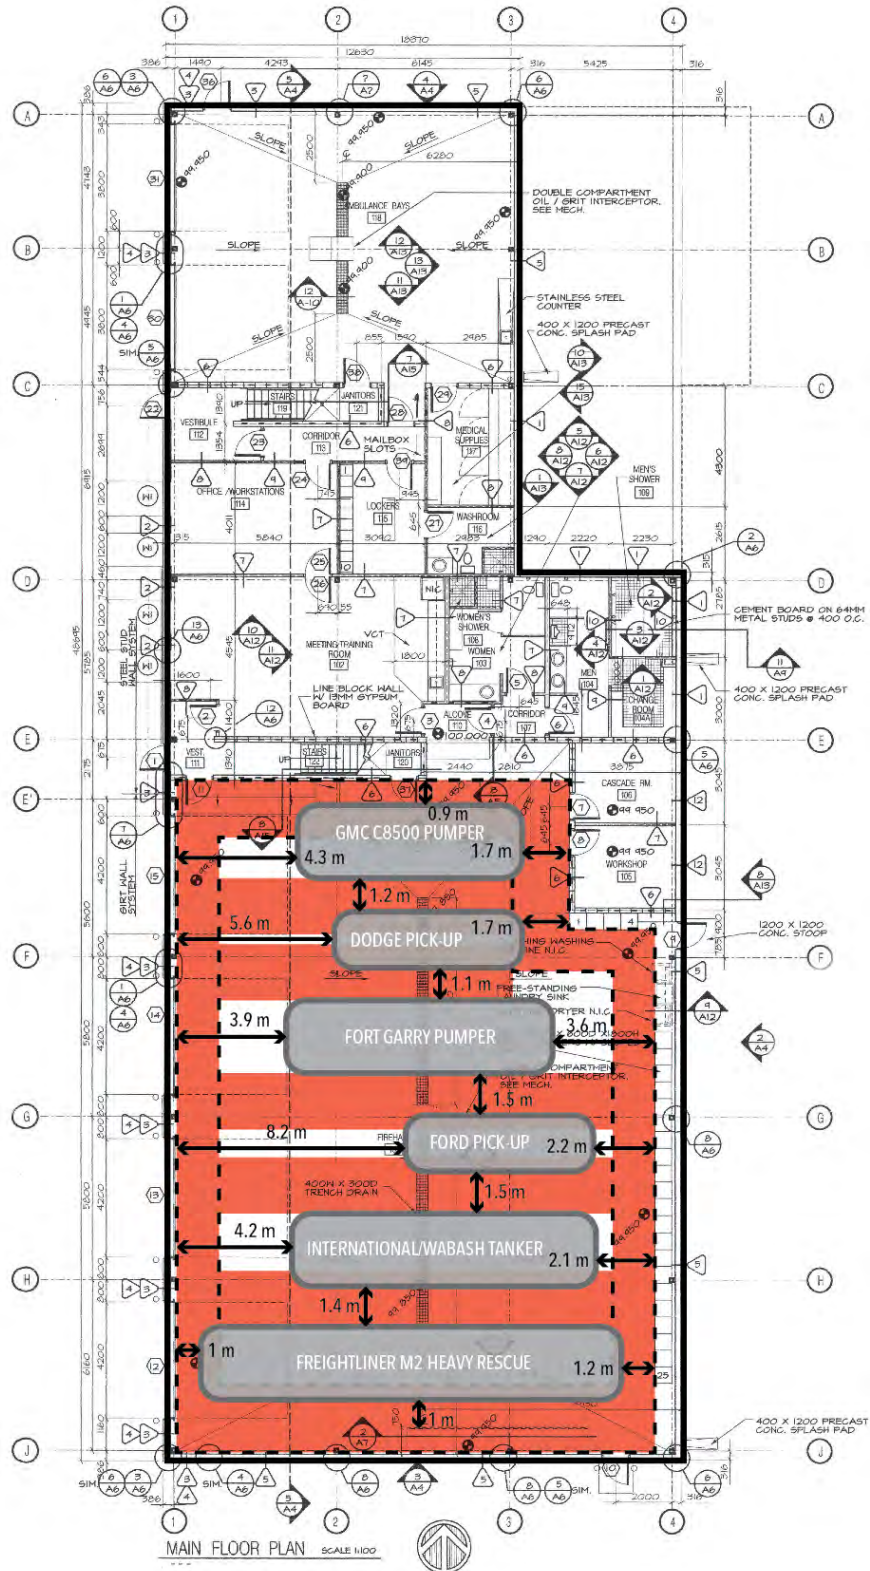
Existing floor plan showing configuration and clearance issues in Apparatus Bay
